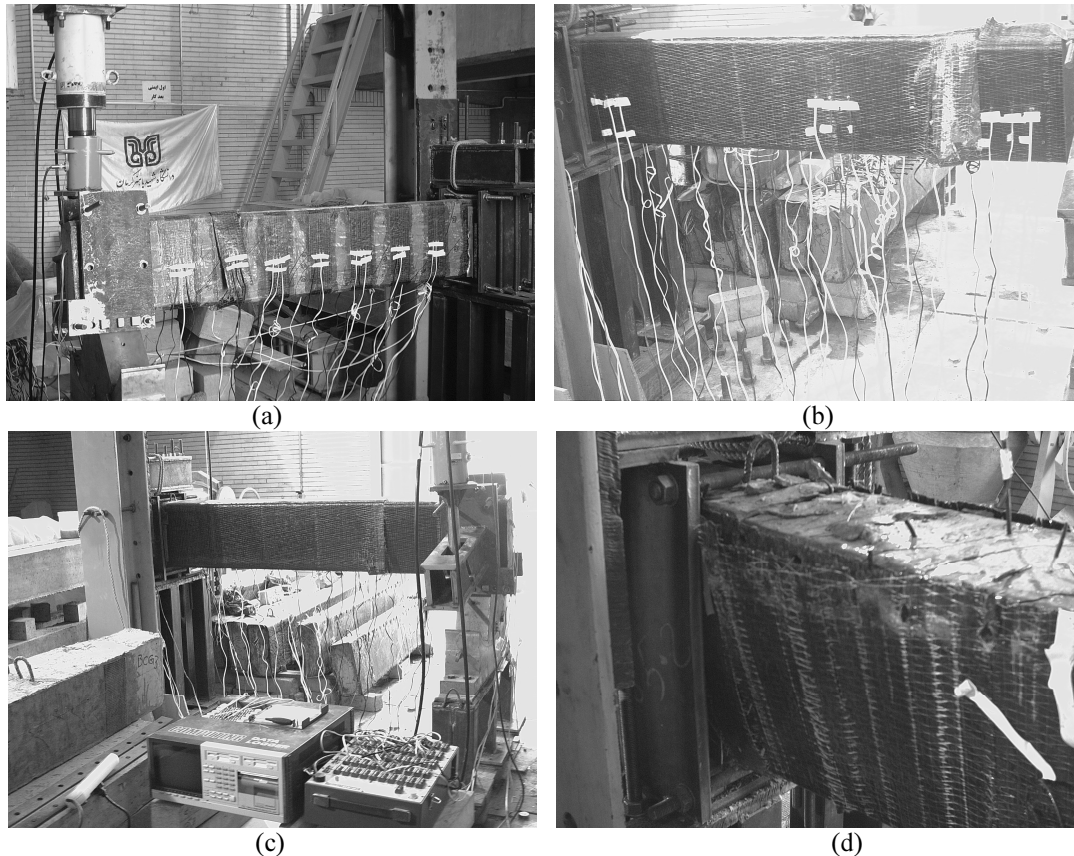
The failure modes of all the strengthened specimen beams: a) Specimen CS1; b) Specimen CW1; c) Specimen CW2; d) Specimen CUJ-anc
